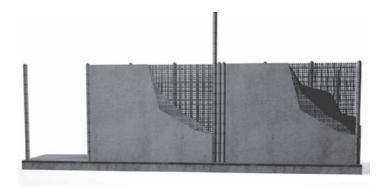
Hollow and Solid Bahareque walls (Courtesy: Arch. Daniel Romero).
